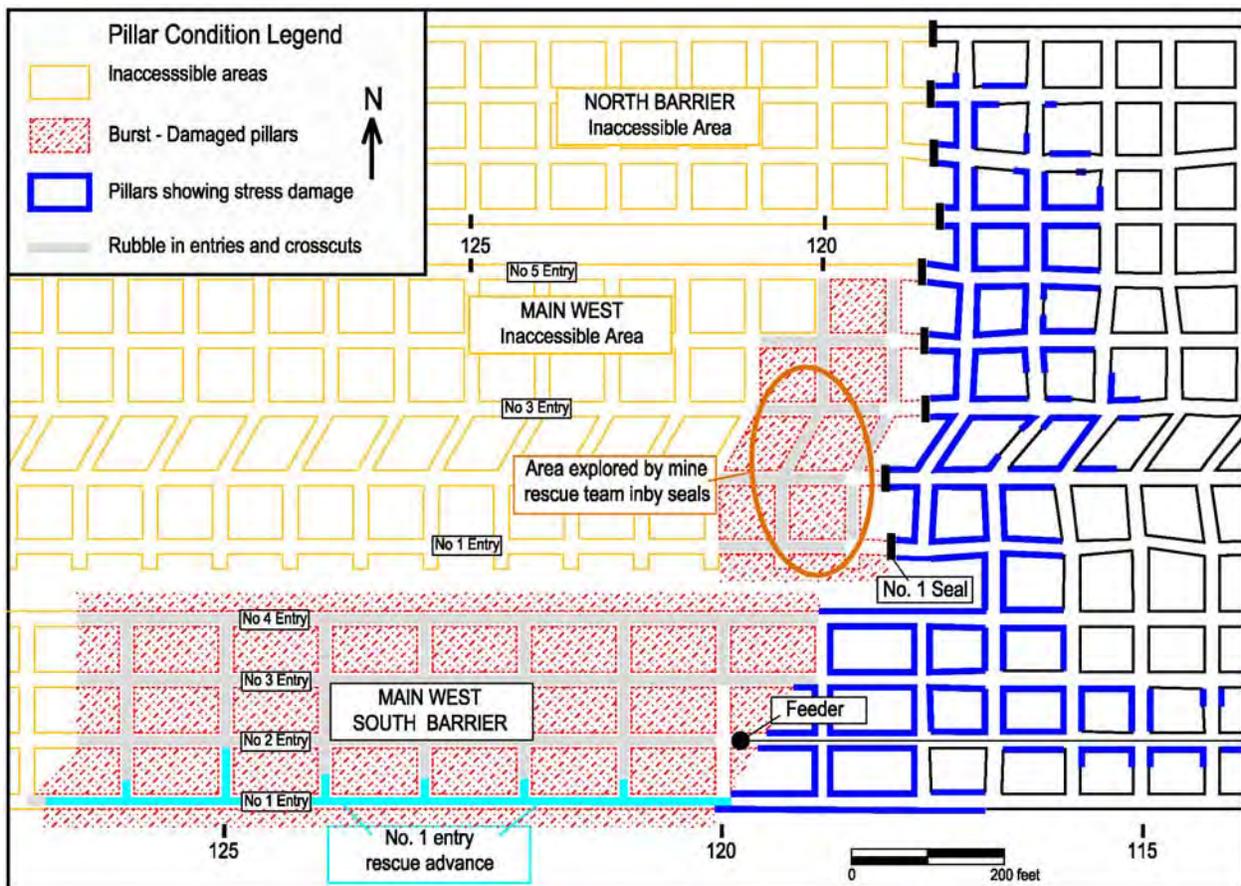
Extent of Pillar Rib Damage Outby Crosscut 119
